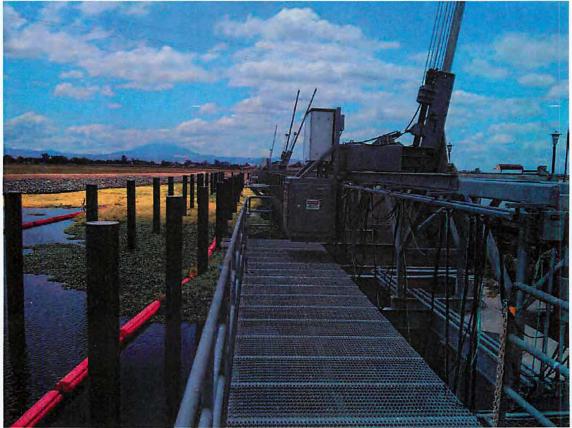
Existing safety deck and hydraulic rakes on the northeast side of the RSFS (Reclamation 2016).
